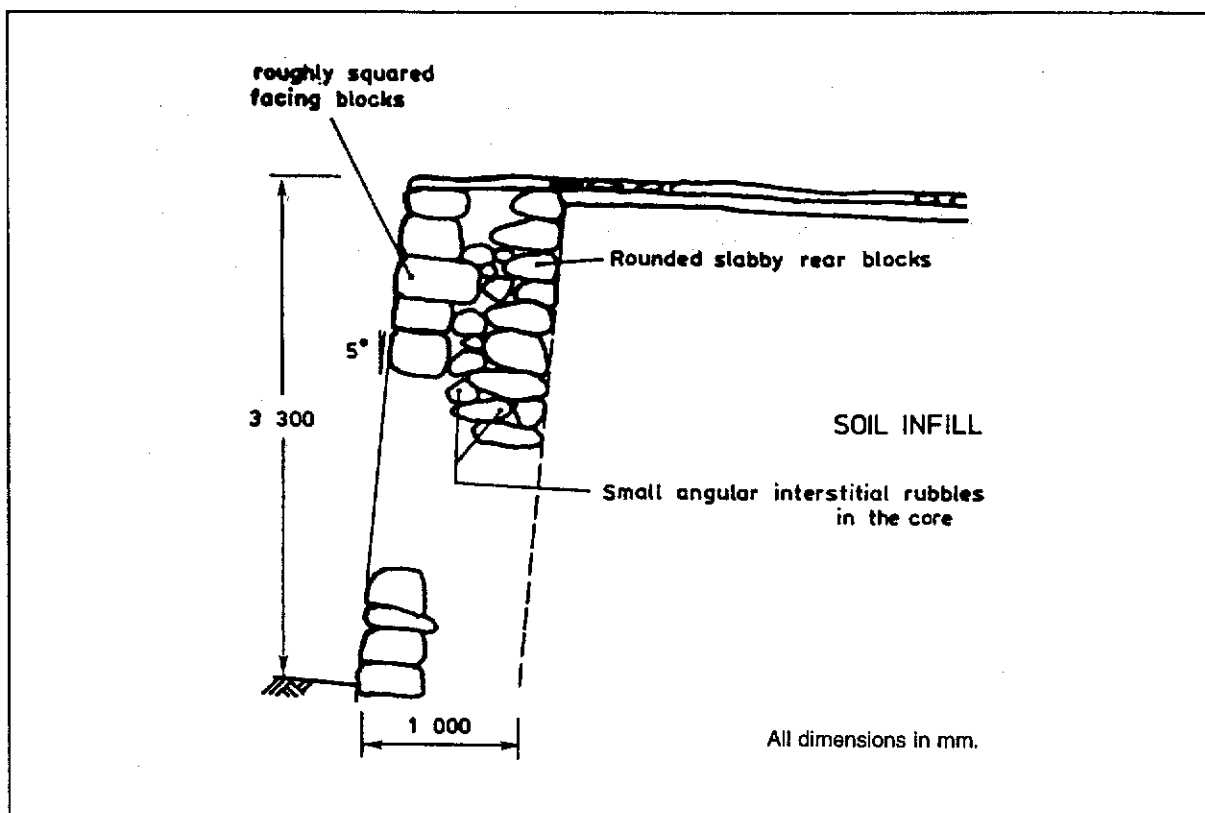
Section of the Stone Rubble Retaining Walls at Tung Lung Fort
